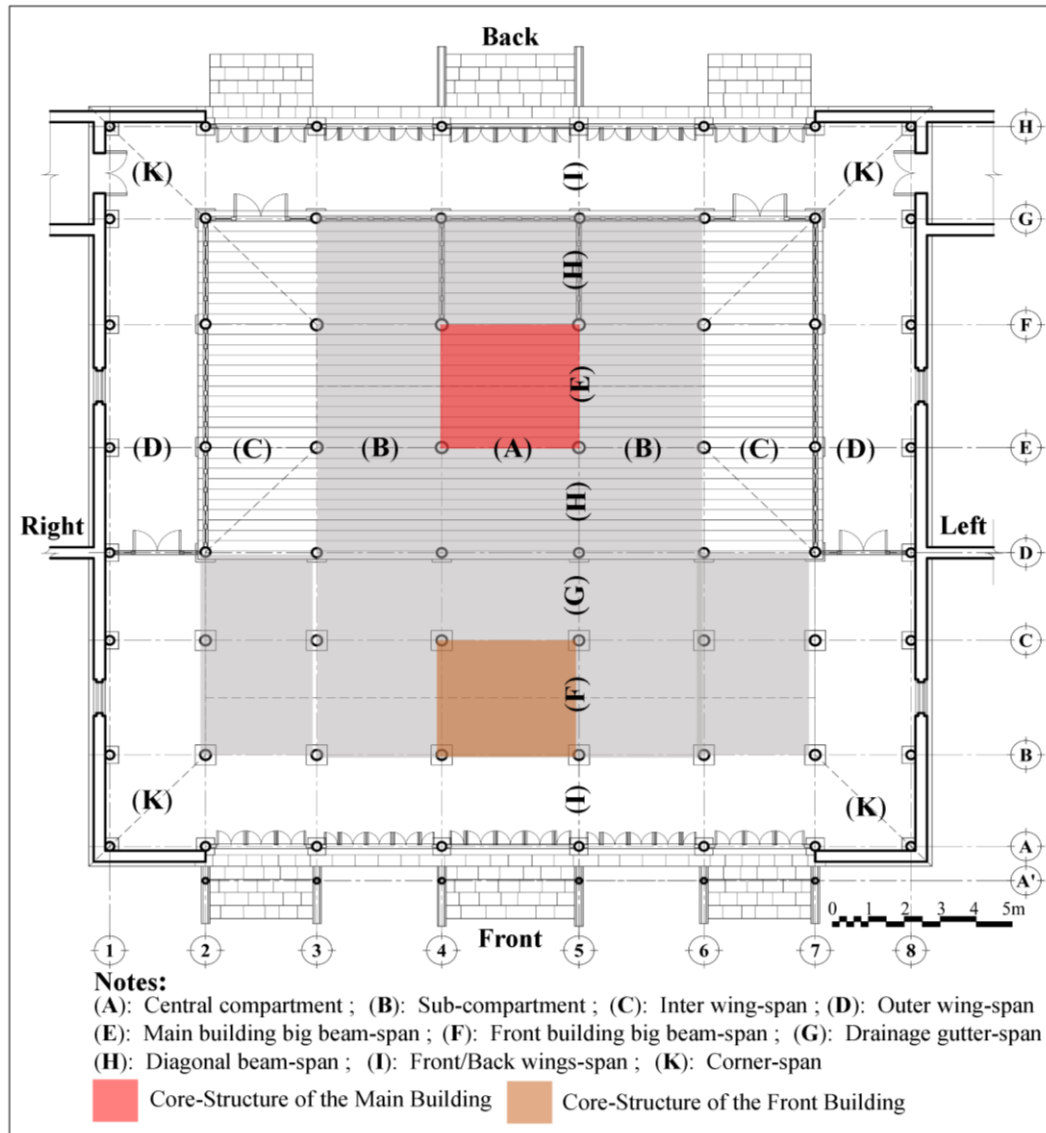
Layout of the floor plan (case of the Sung An Dien Temple, Ming Mang's Mausoleum)
